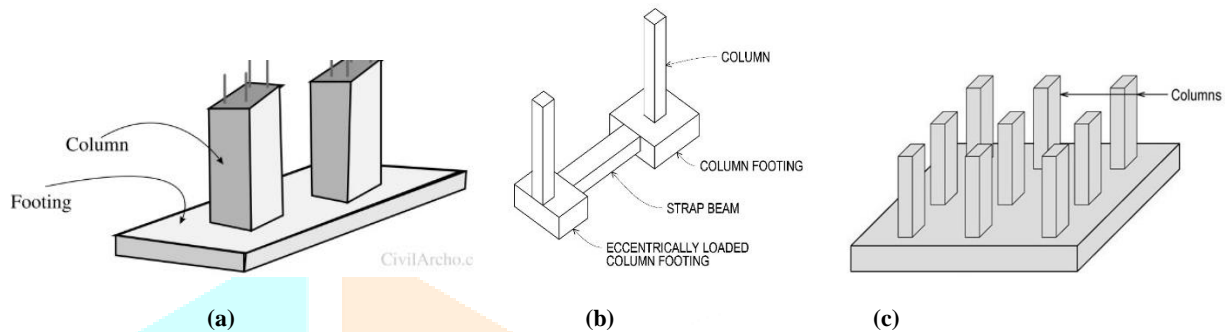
(a) Combined Footing (b) Cantilever or Strap Footing (c) Raft or Mat foundations
